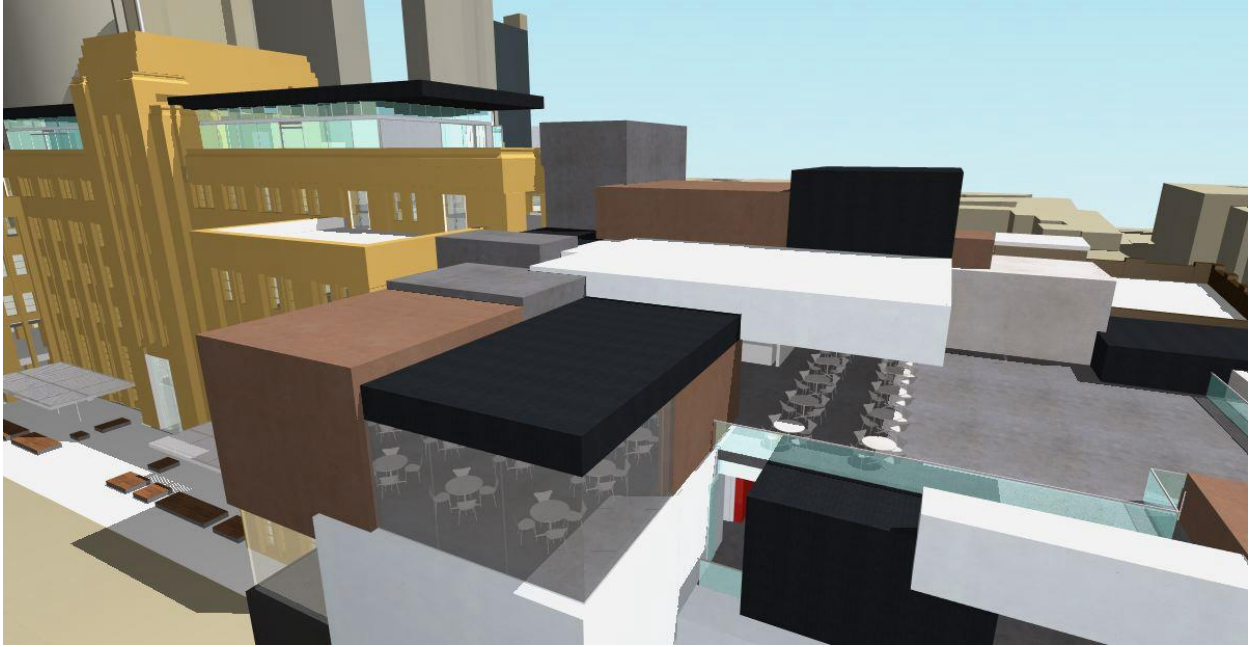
Level 6 stair as originally proposed and as amended, looking south
